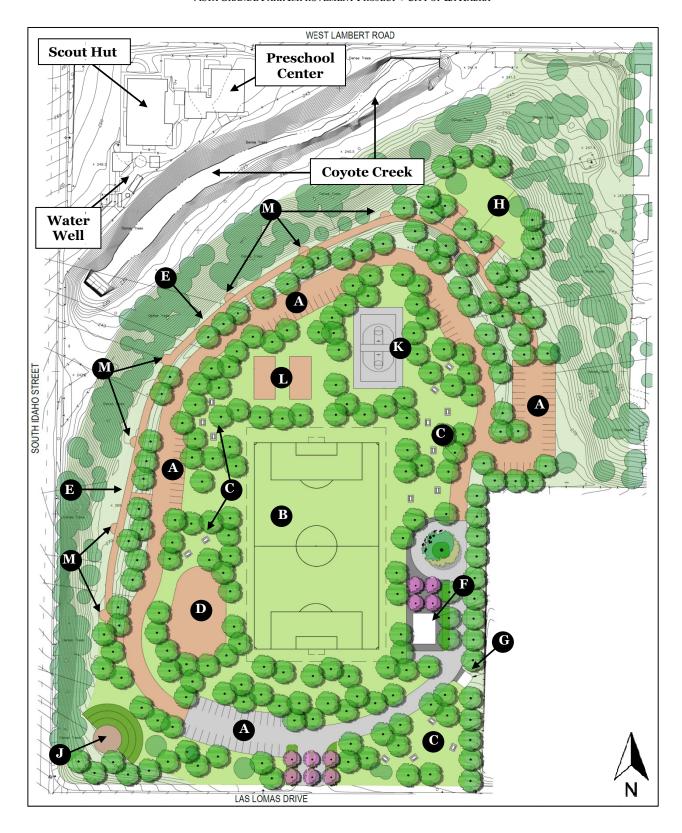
CONCEPTUAL SITE PLAN (ALTERNATIVE A)
